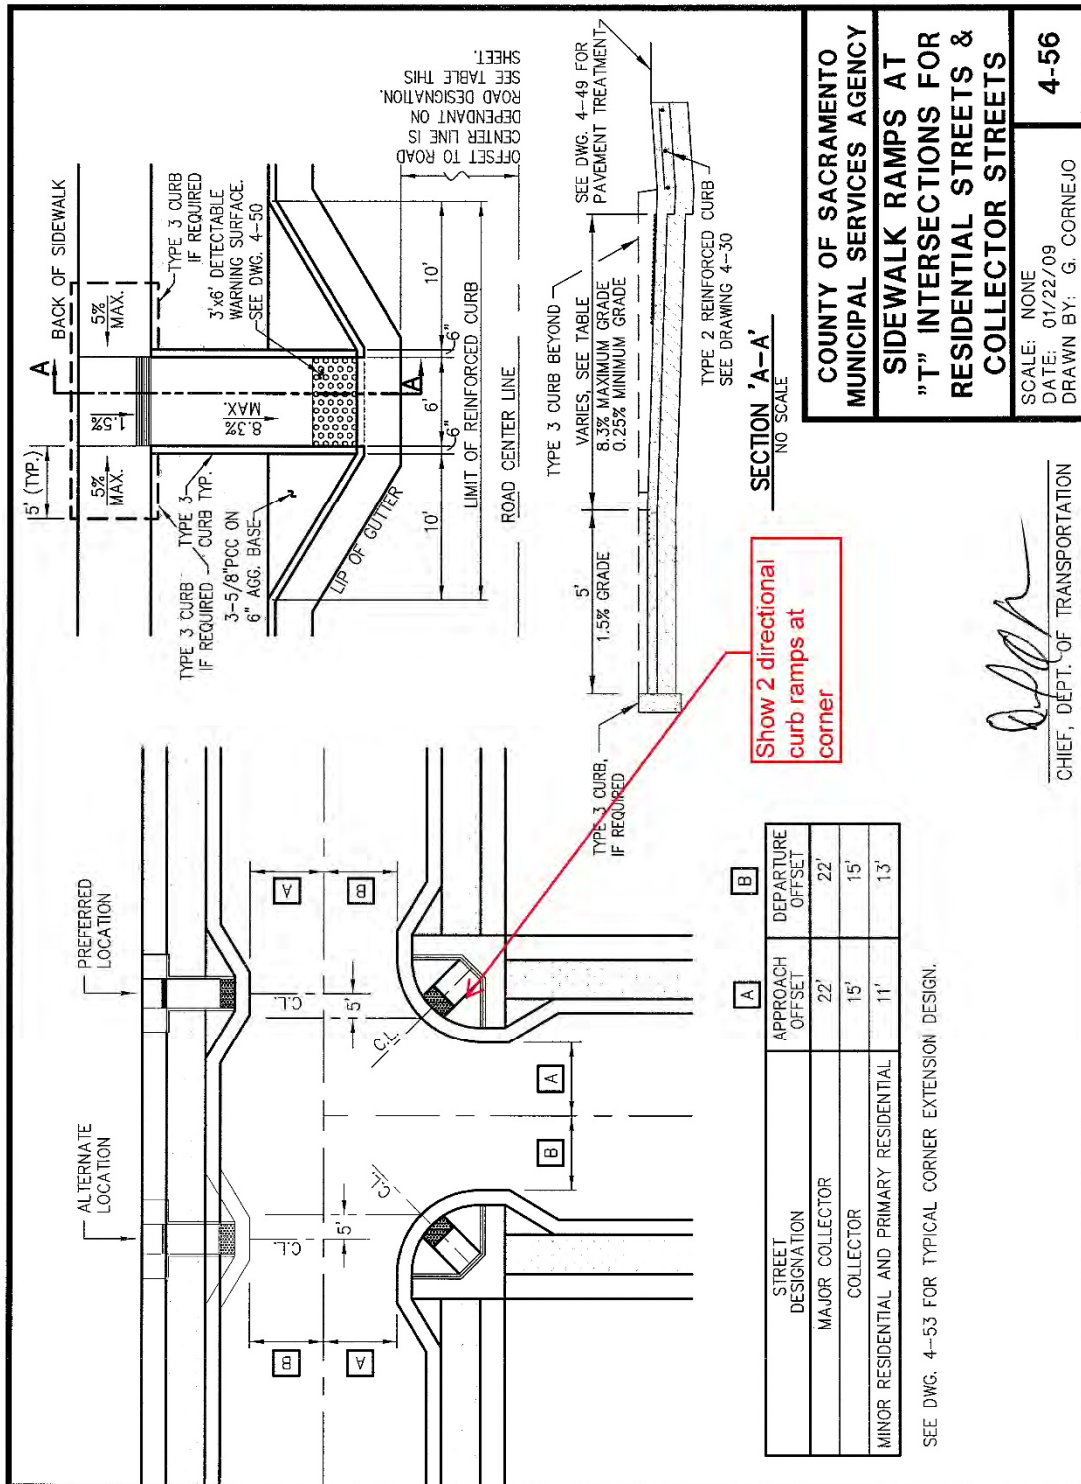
Standard Drawing Markup – Sidewalk Ramps at "T" Intersections for Residential & Collector Streets
